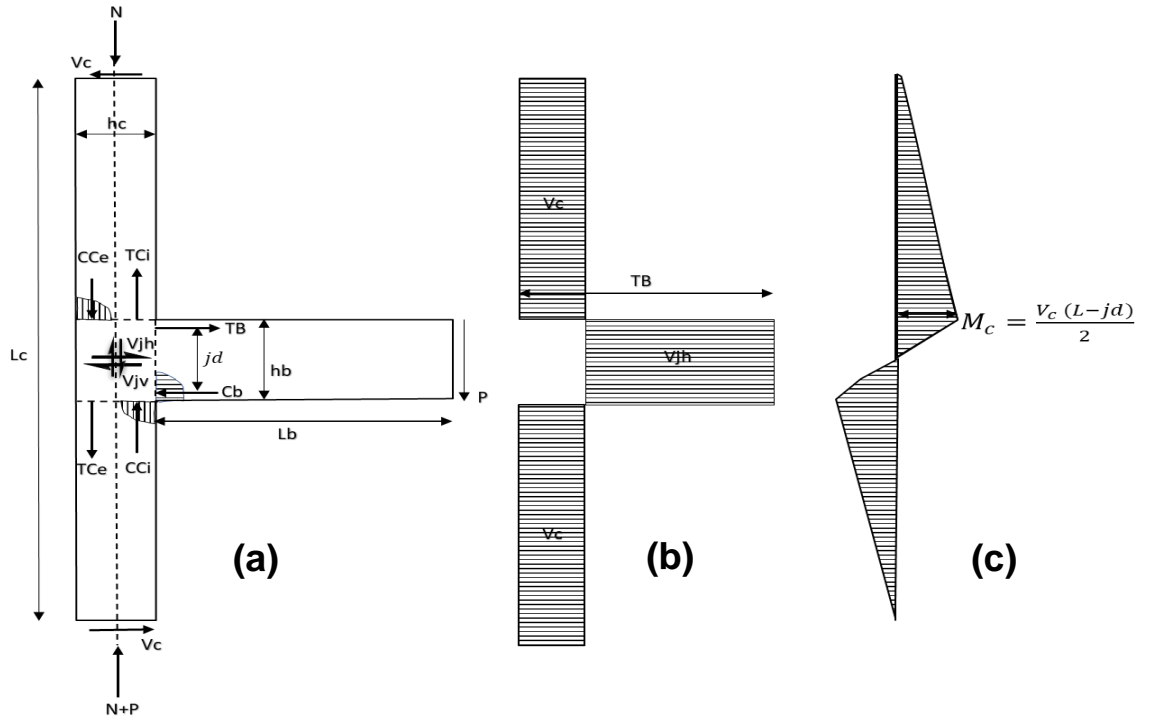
a) Acting forces on the beam and column b) joint shear forces c) column and joint bending moment
